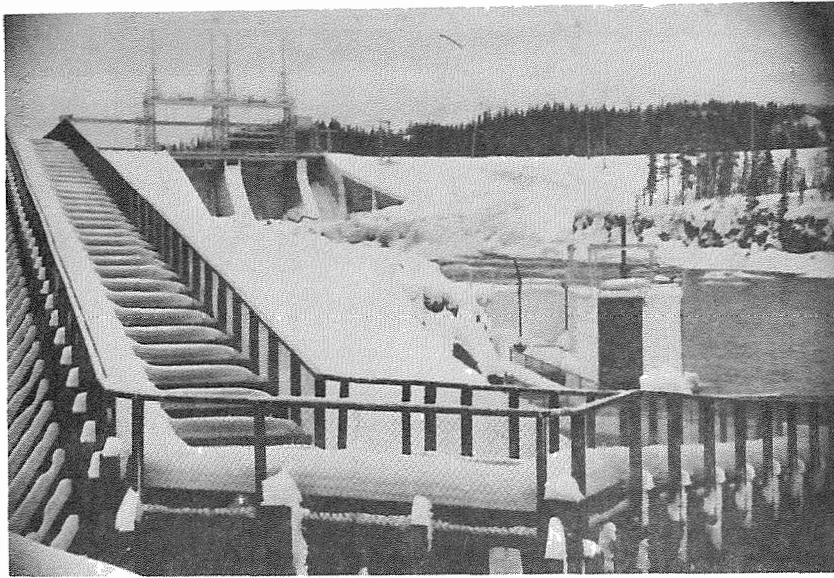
Lower section of fishway above entrance (Spring, 1973).
